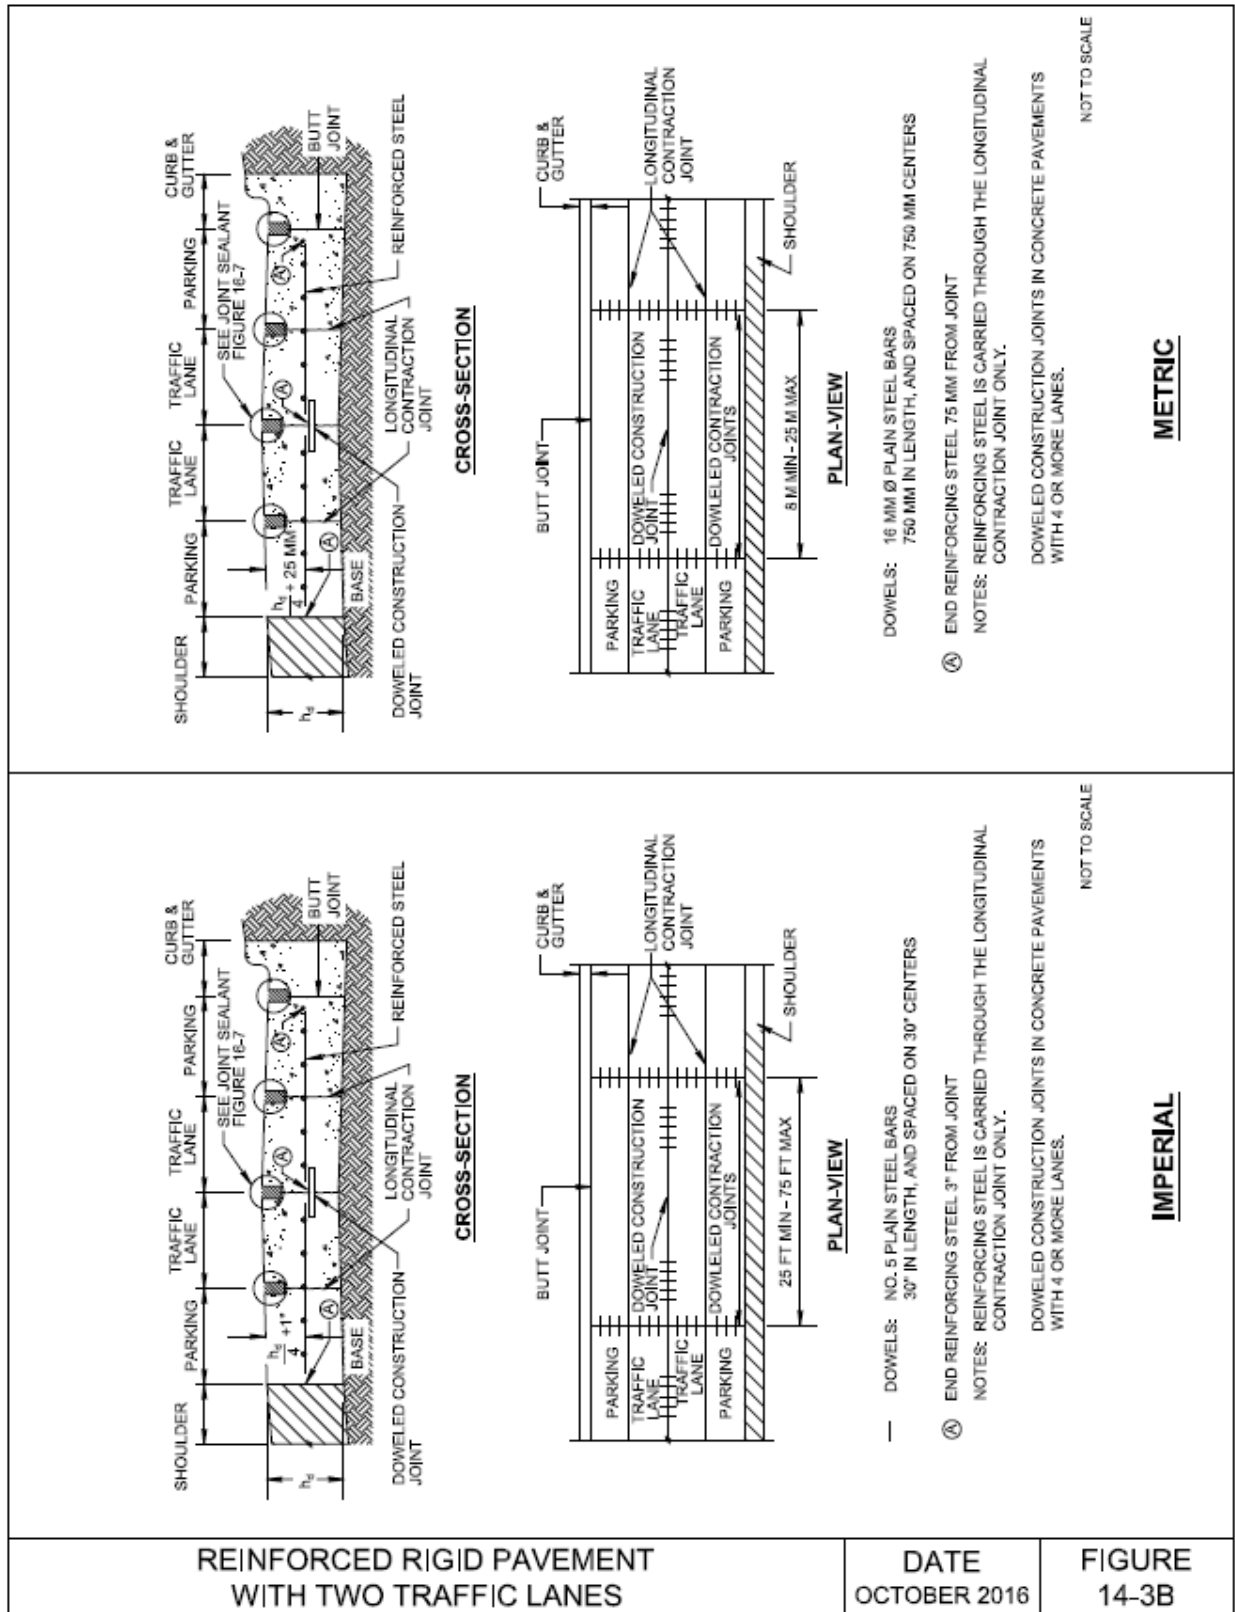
Reinforced Rigid Pavement with Traffic and Parking Lanes
